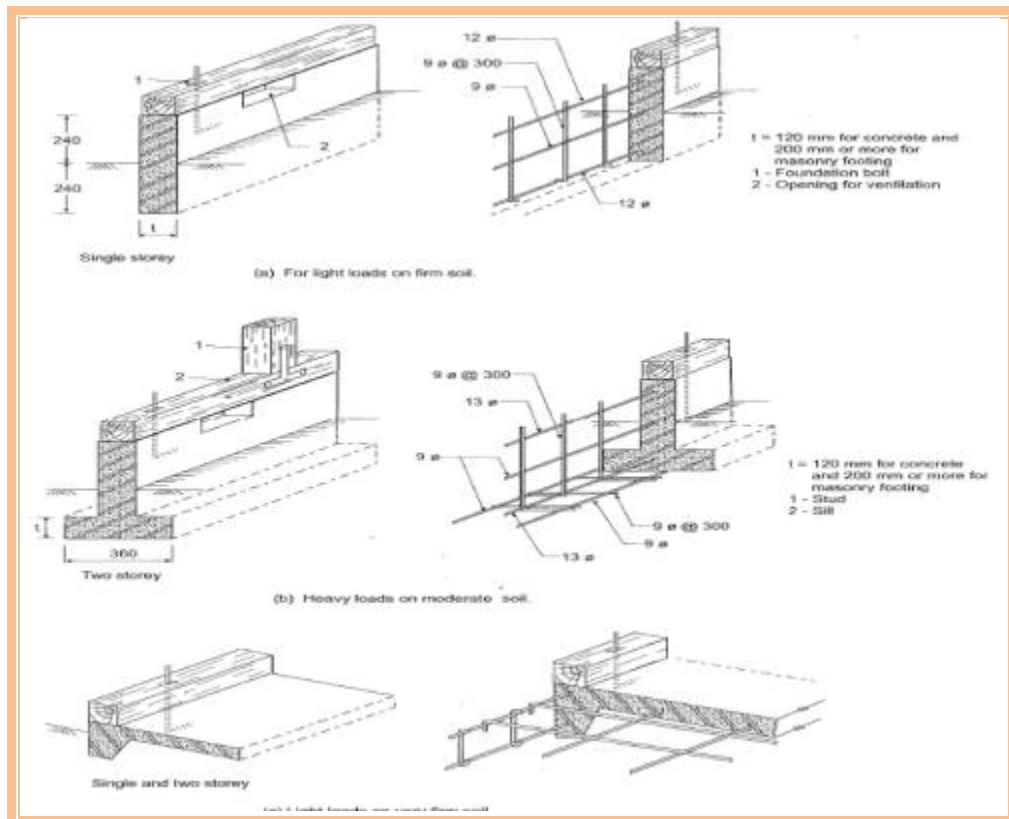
detailed of timber construction foundation details (Rush, 2007)
